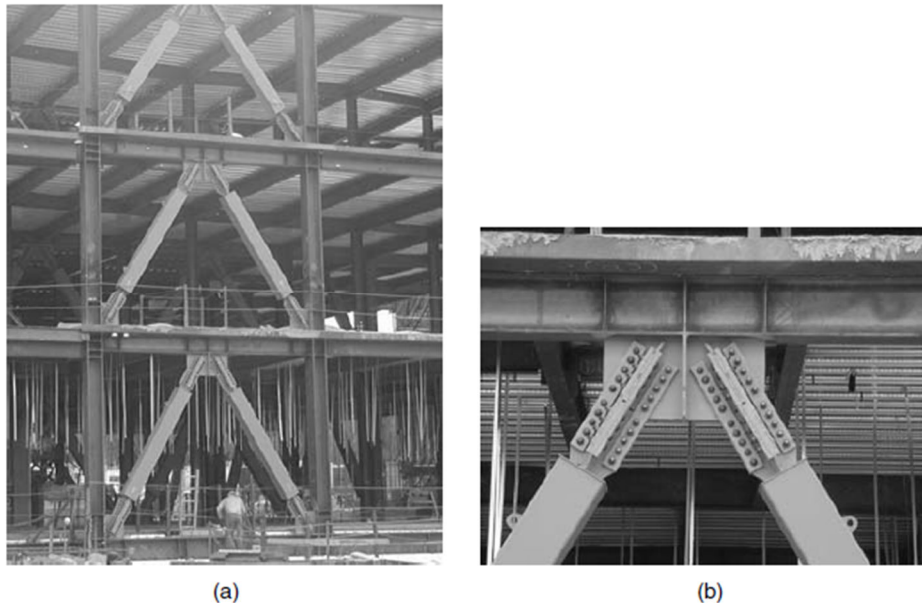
Buckling-restrained brace frames for new construction. (a) Elevation; (b) connection details (courtesy of SIE, Inc.)^[2.3]
